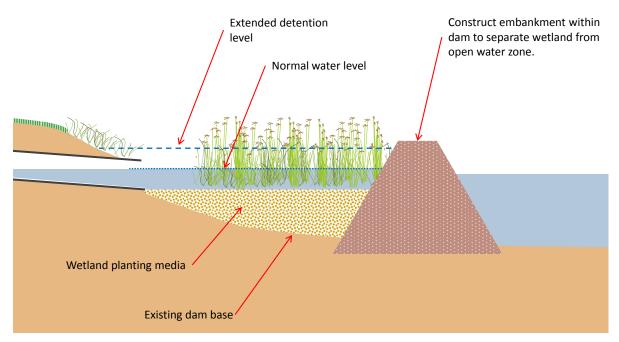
Schematic section through proposed vegetated wetland, to be constructed as a fringing wetland within existing dams
